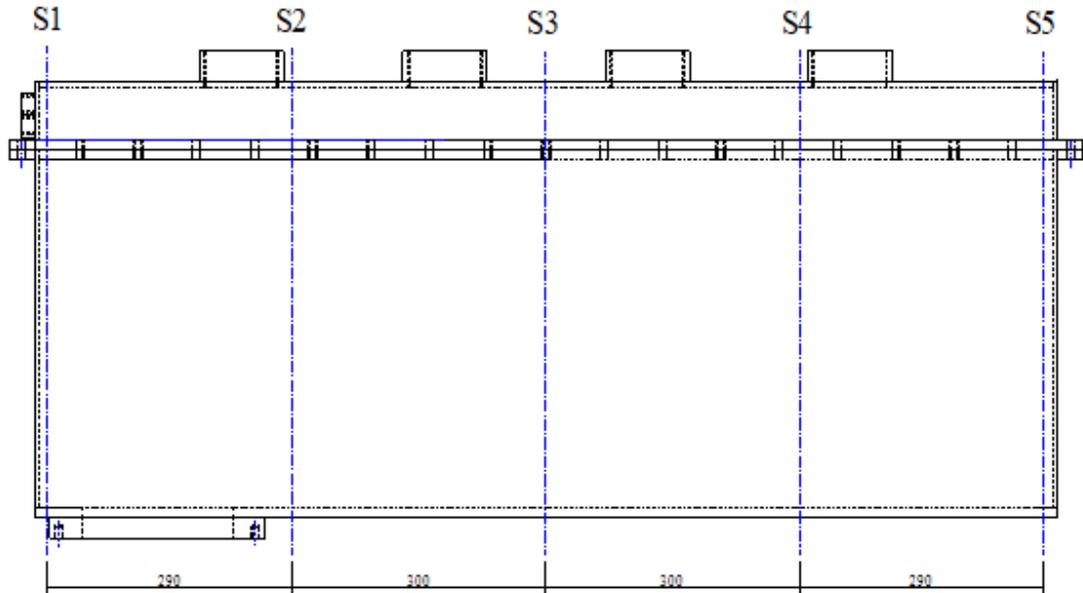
Planned sampling of the backfill. The sampling was made in five cross-sections, S1 to S5.
